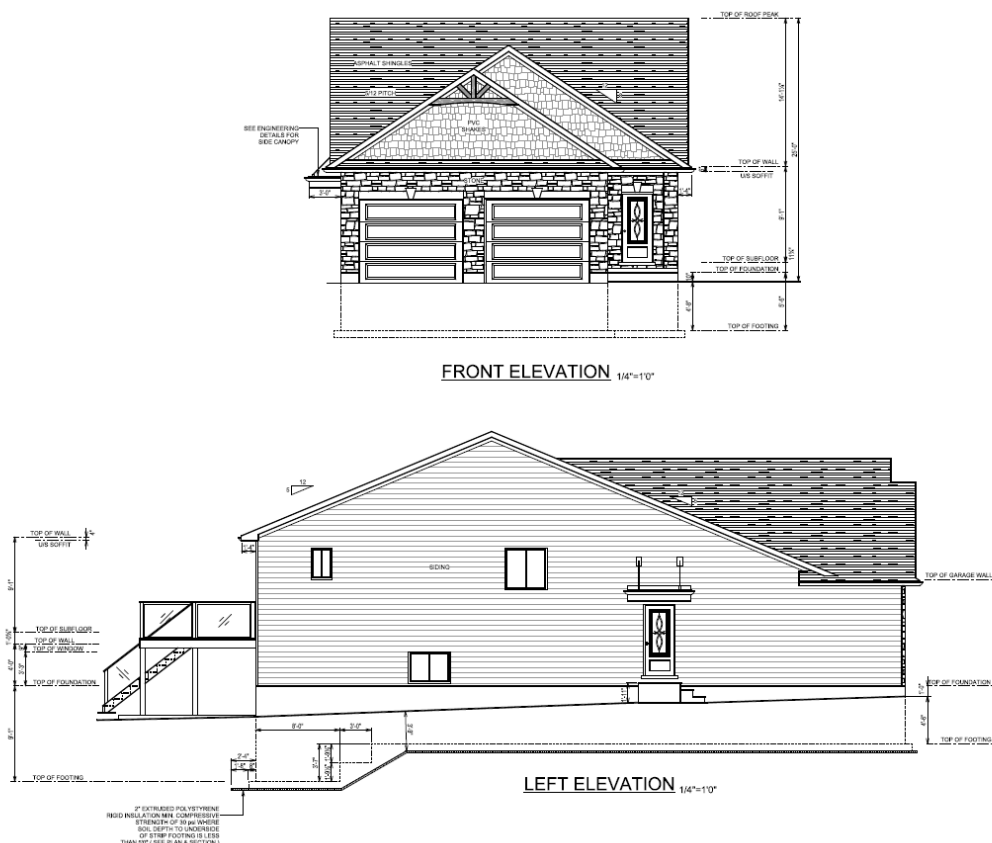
Excerpted Elevations - Single Detached Dwelling with ARU.
